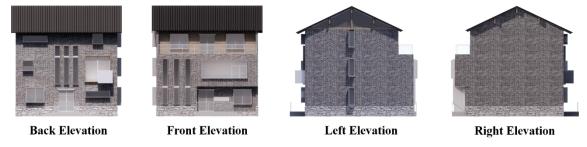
Four Elevations of Building No. 3 (Drawn by the author)
